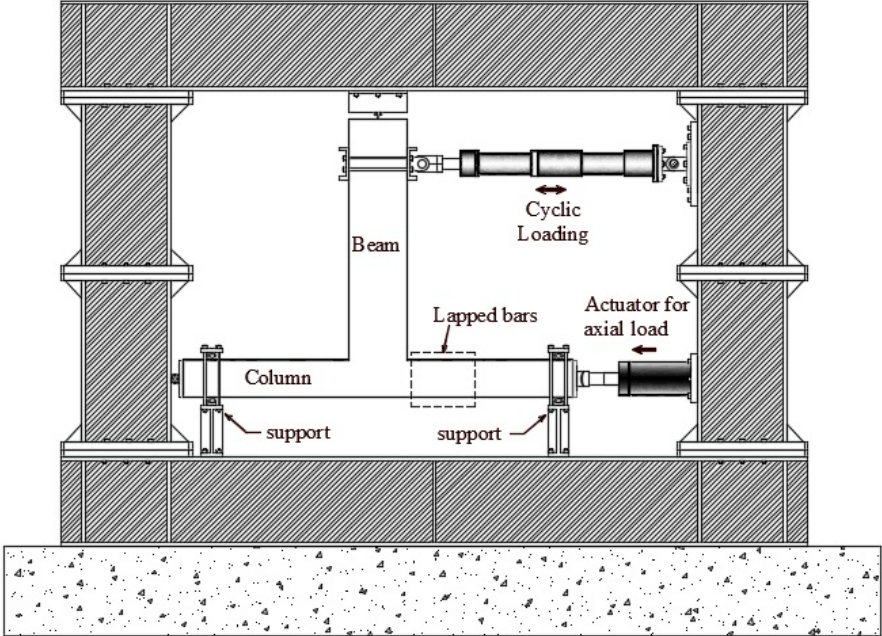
Test setup of bare RC joints (units: mm), adapted from [36].
